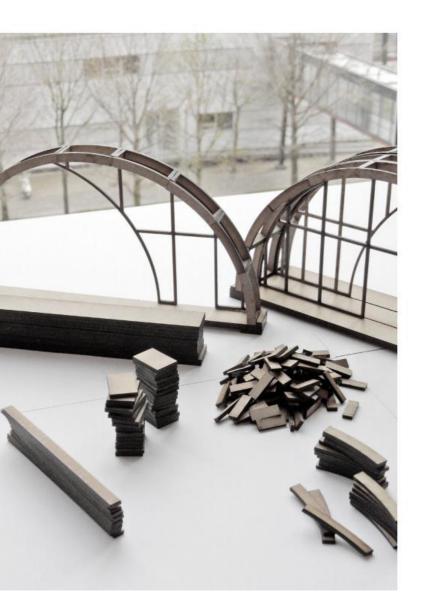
Phase 1 + concrete beams + temporary steel structure + elements + steel profiles
